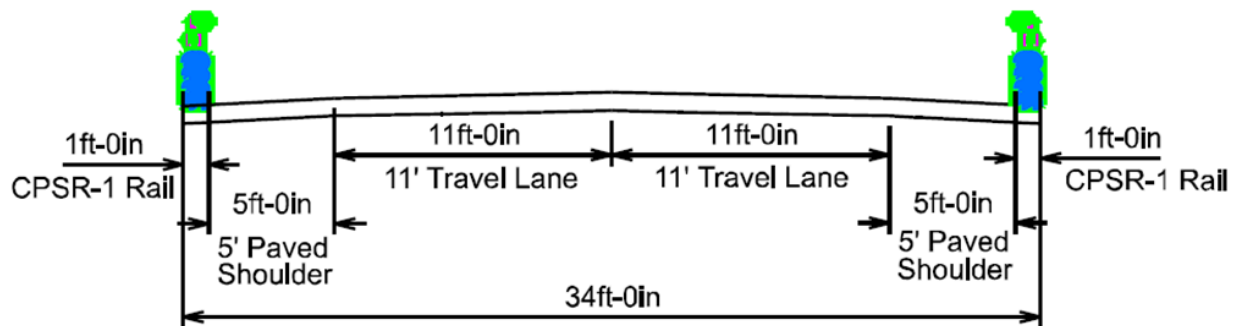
Updated Deck Width Profile View: Typical Section without Beam
